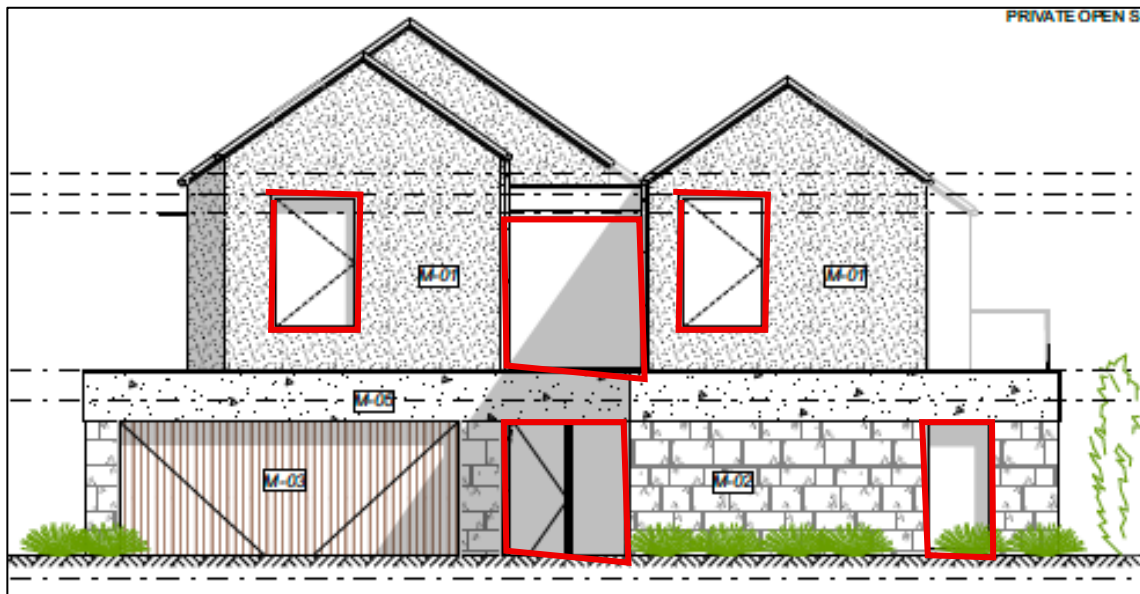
Street facing façade (windows outlined in red. Garage door width 5.8m)
